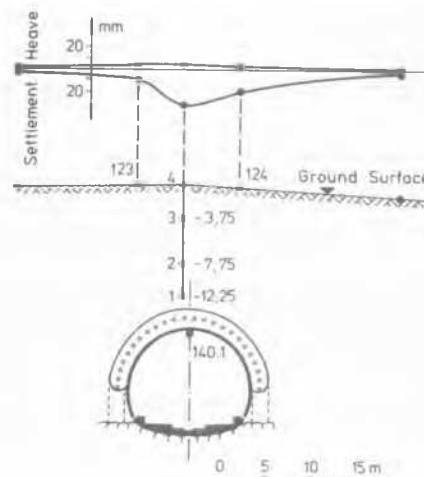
Heave-Settlement Distribution Section 5 Cross-Section
